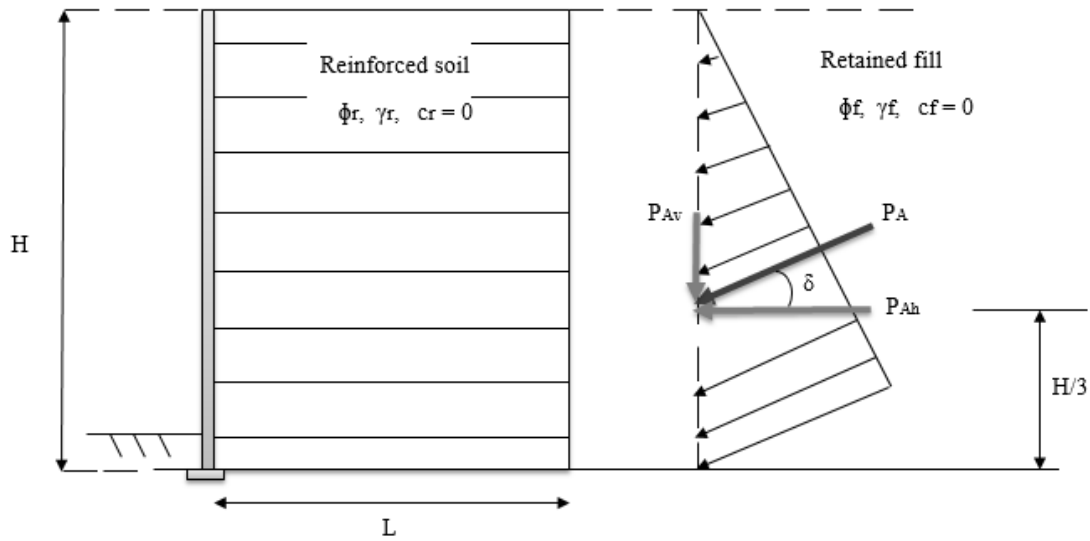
Coulomb earth pressure distribution for reinforced earth wall.
